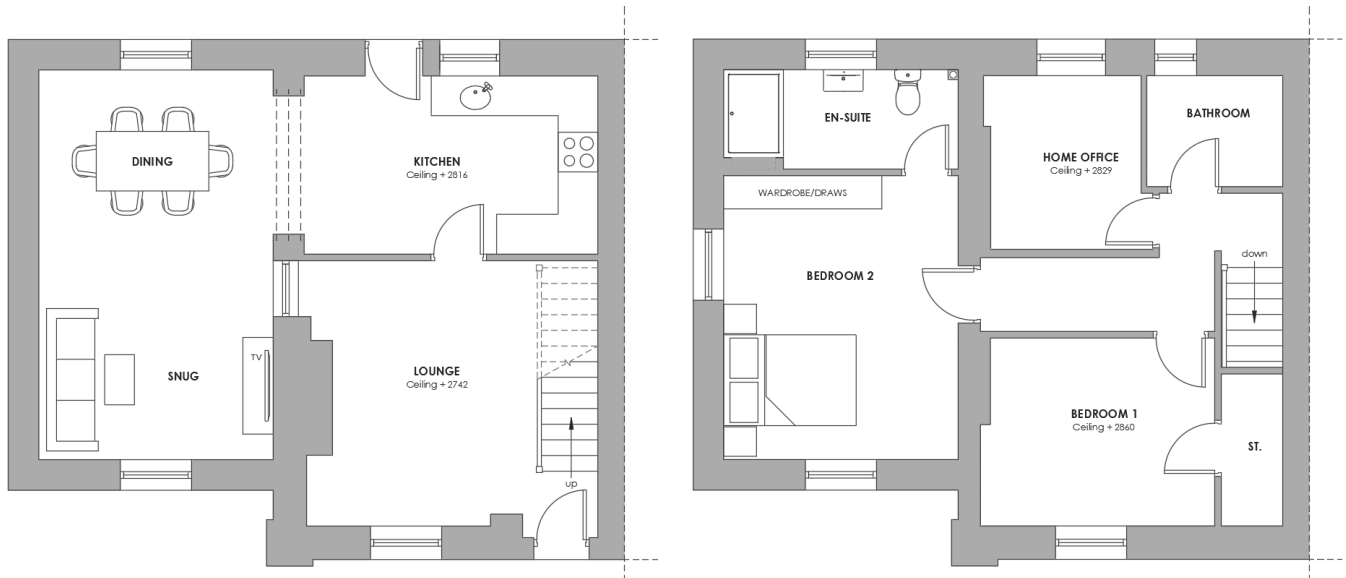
PROPOSED GROUND AND FIRST FLOOR PLANS
